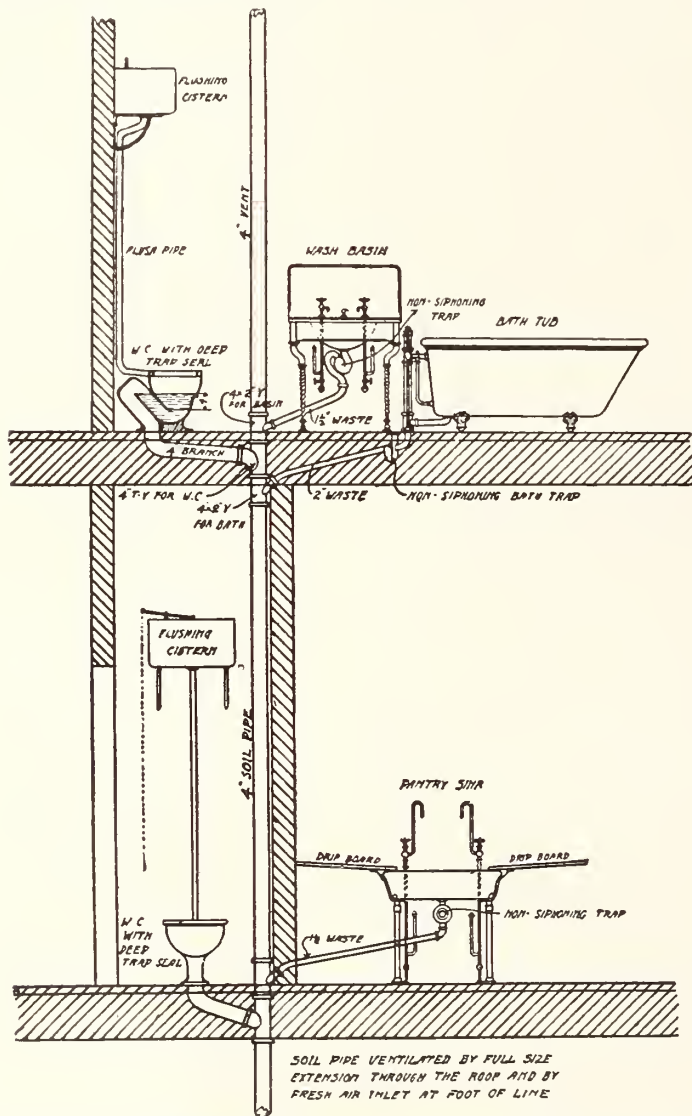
Section through bathroom on second floor, and through butler's pantry and toilet room on first floor, showing simplified plumbing.
